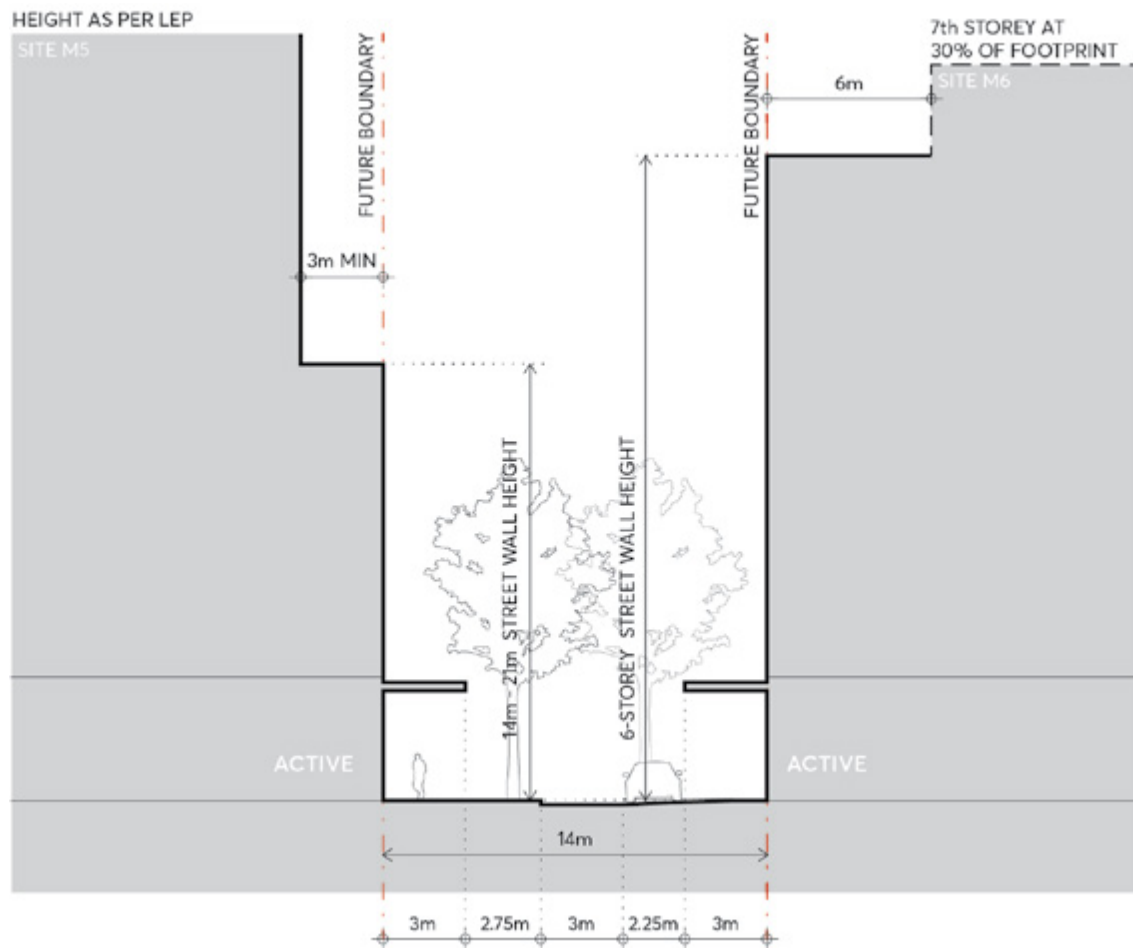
Future Horwood Place (Section C) Setbacks & Street Wall Height
